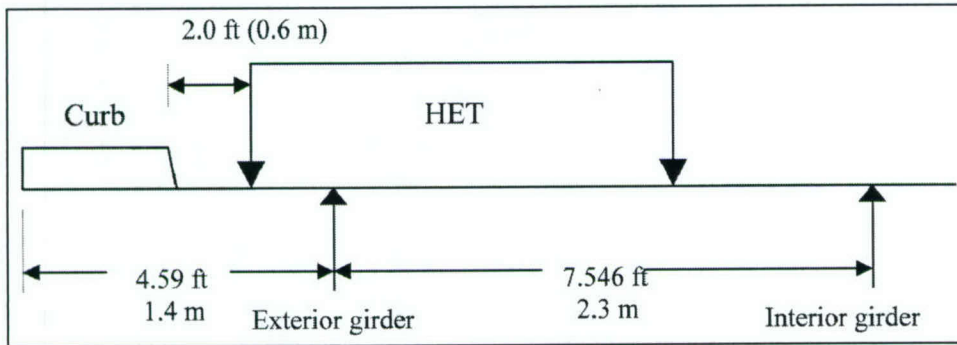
Placement of vehicle for the maximum load on the exterior girder
